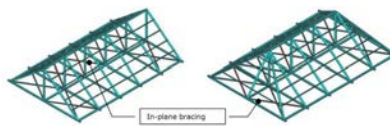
2. In-plane bracing between trusses at the truss bottom chord level shown in red. Note: It is difficult to cross over two diagonals of timber. It is not usual practice. Even in the dhajji square frames, one will see that they make one diagonal and two short cross diagonals. Rather than overlap two longer pieces. The long timber shown parallel with the ridge along the bottom of the tie beams does not exist in most roofs. Realistically most roofs are stiffened only by ceilings and bracing is not used.
